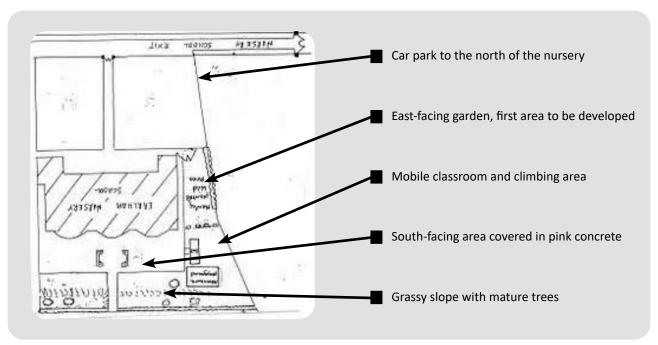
Plan of garden (Private Collection, Norwich, 2000)
